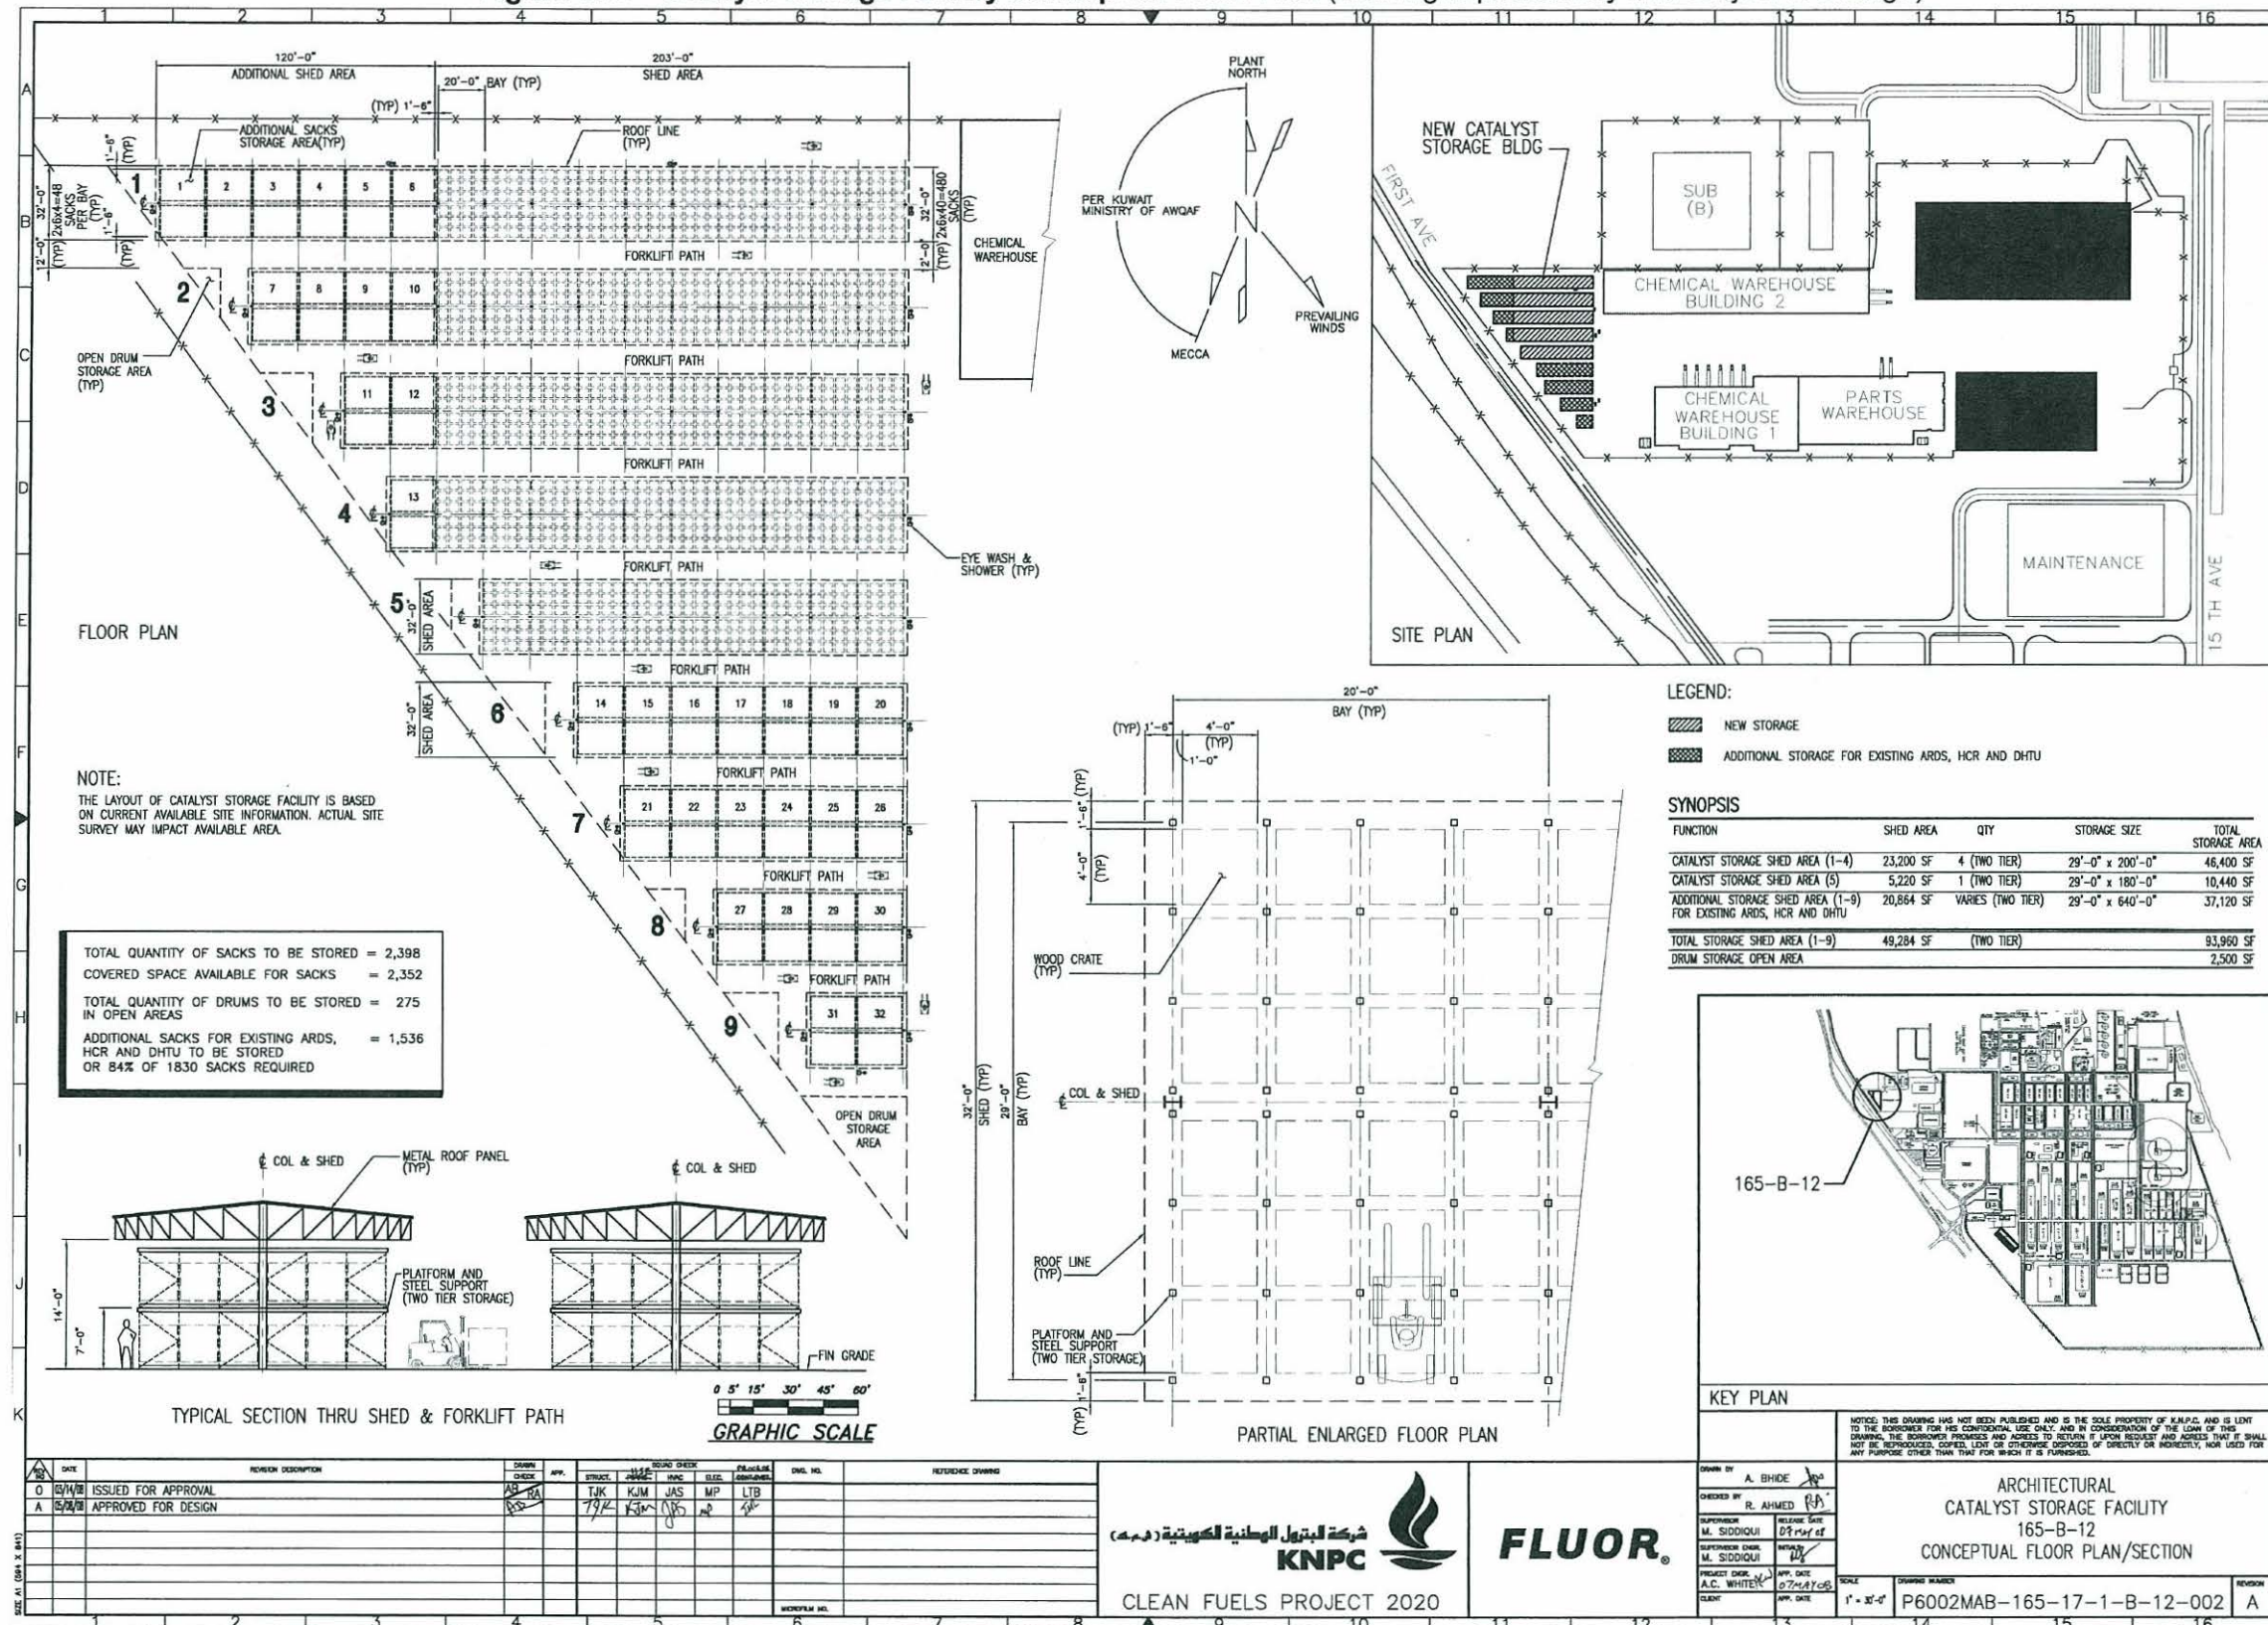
B – Catalyst Storage Facility Conceptual Floor Plan (drawing is preliminary and subject to change)
